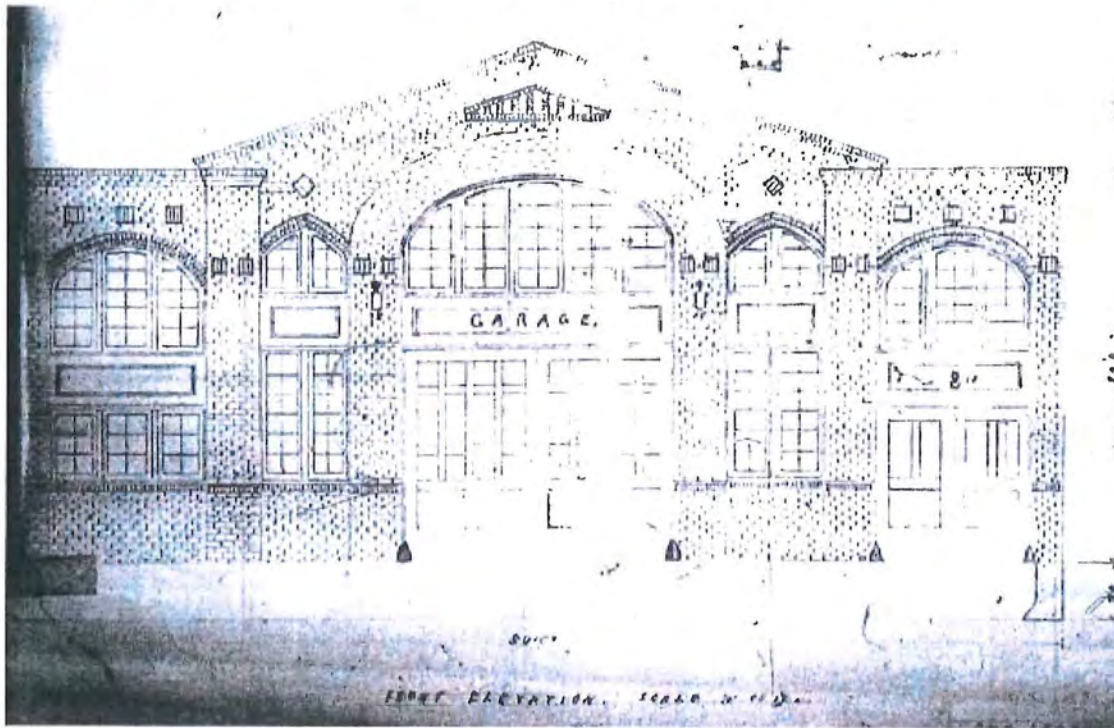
Original elevation drawing of the subject building. Source: SF DBI.
